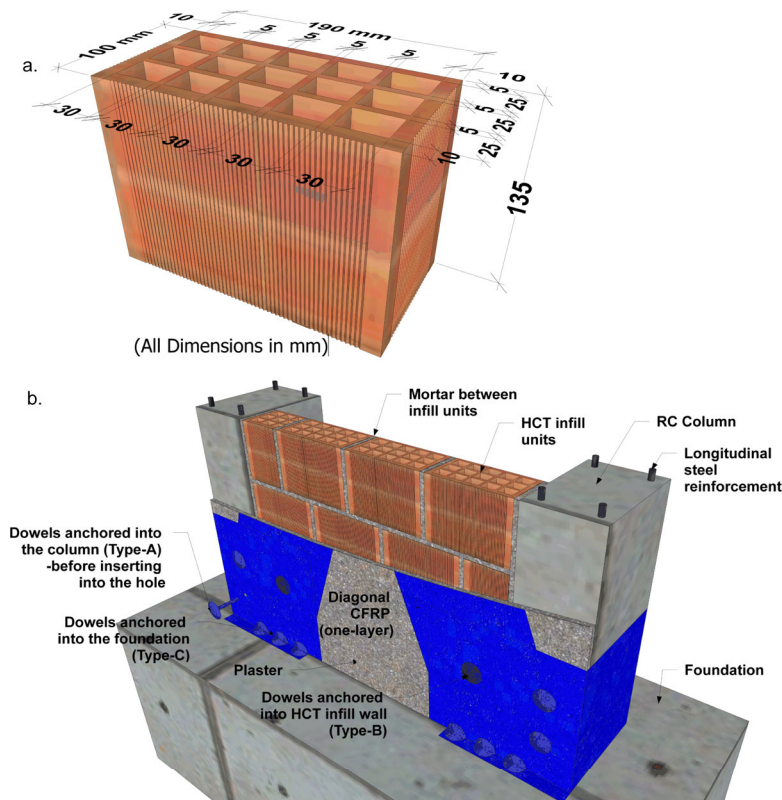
a. Dimensions of the HCT infill unit, b. cross-section of a test specimen.
